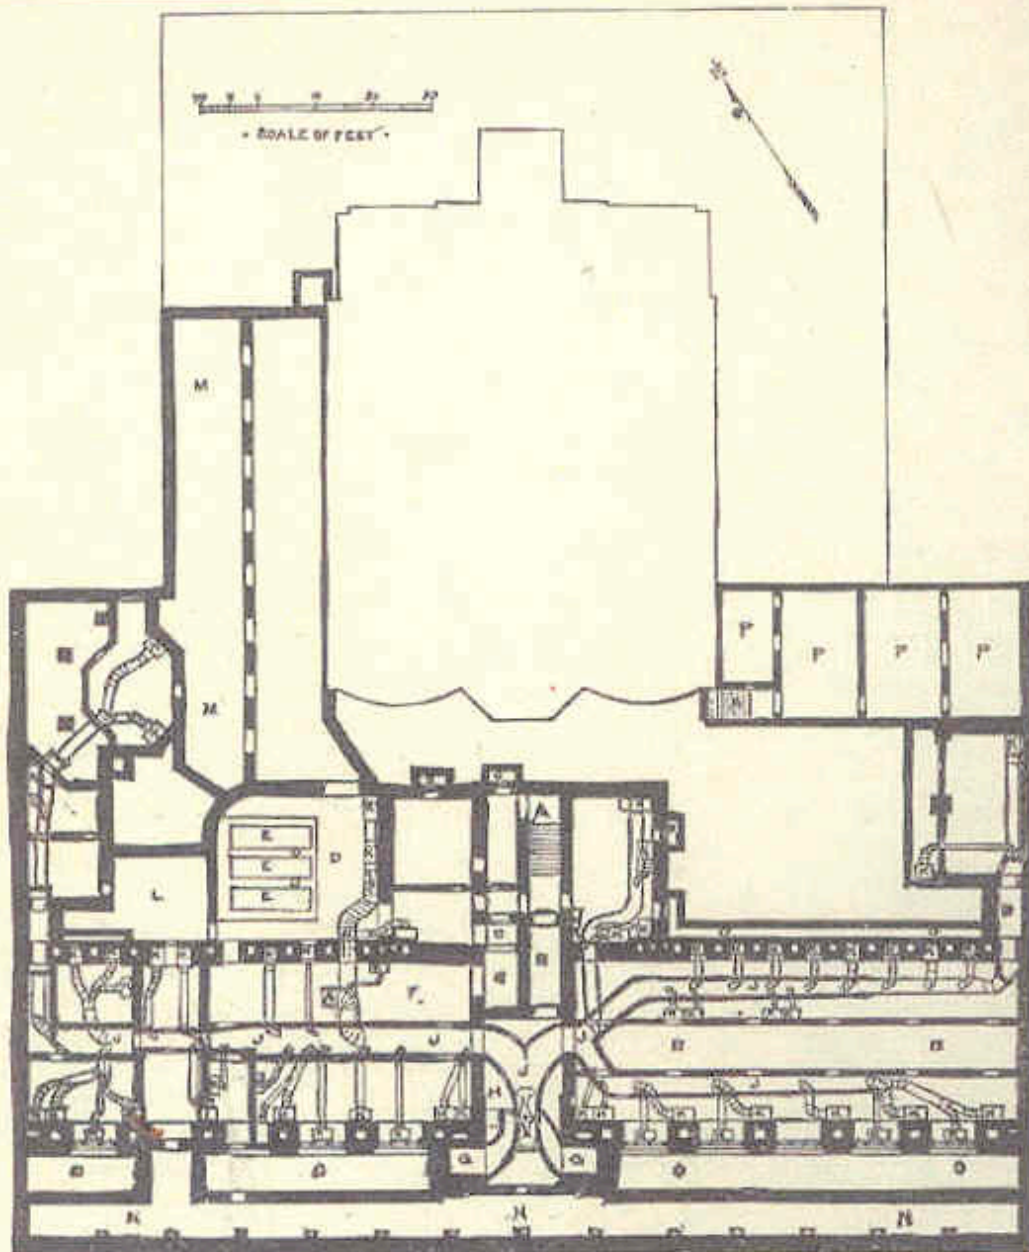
NEW YORK HOSPITAL BUILDINGS.—PLAN OF CELLAR.
